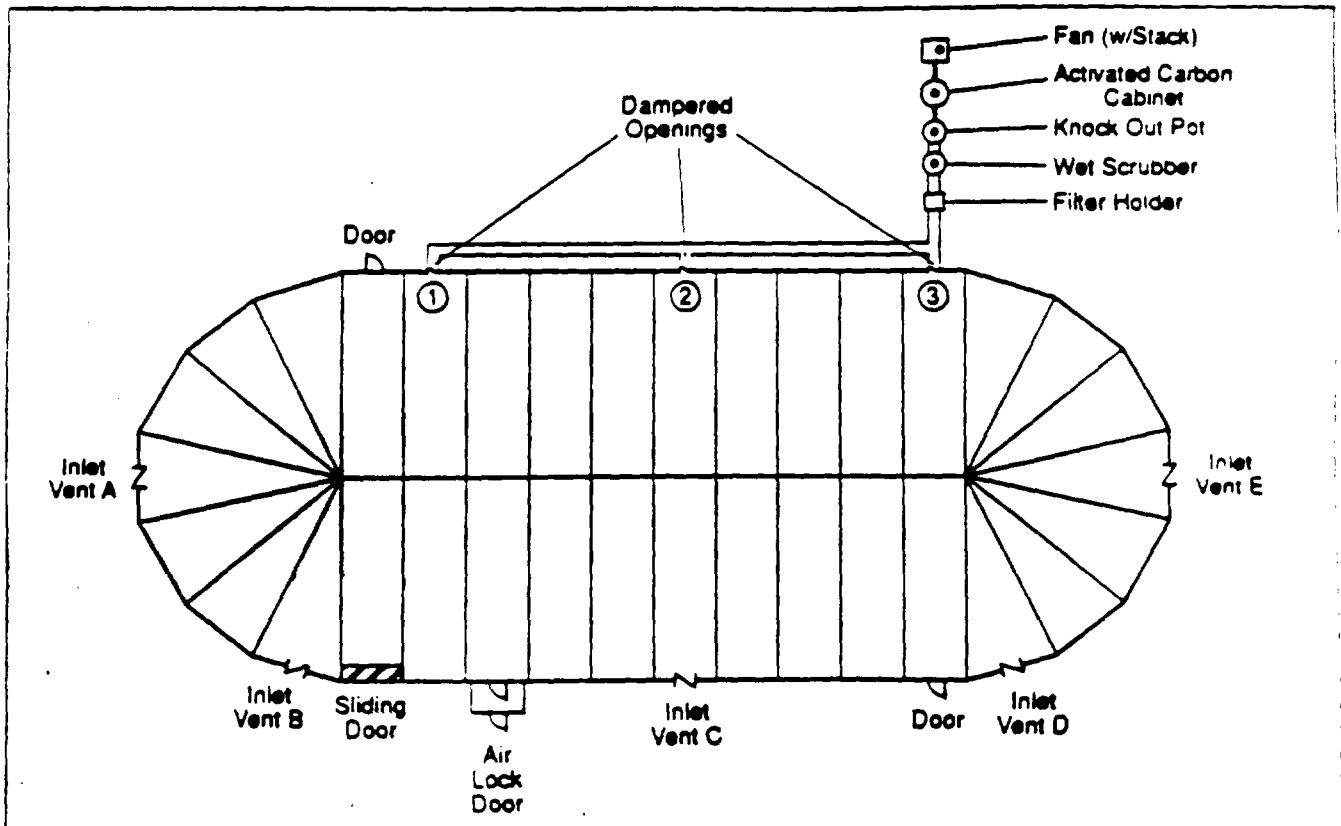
General Arrangement of Ventilation Air Cleaning Equipment.
